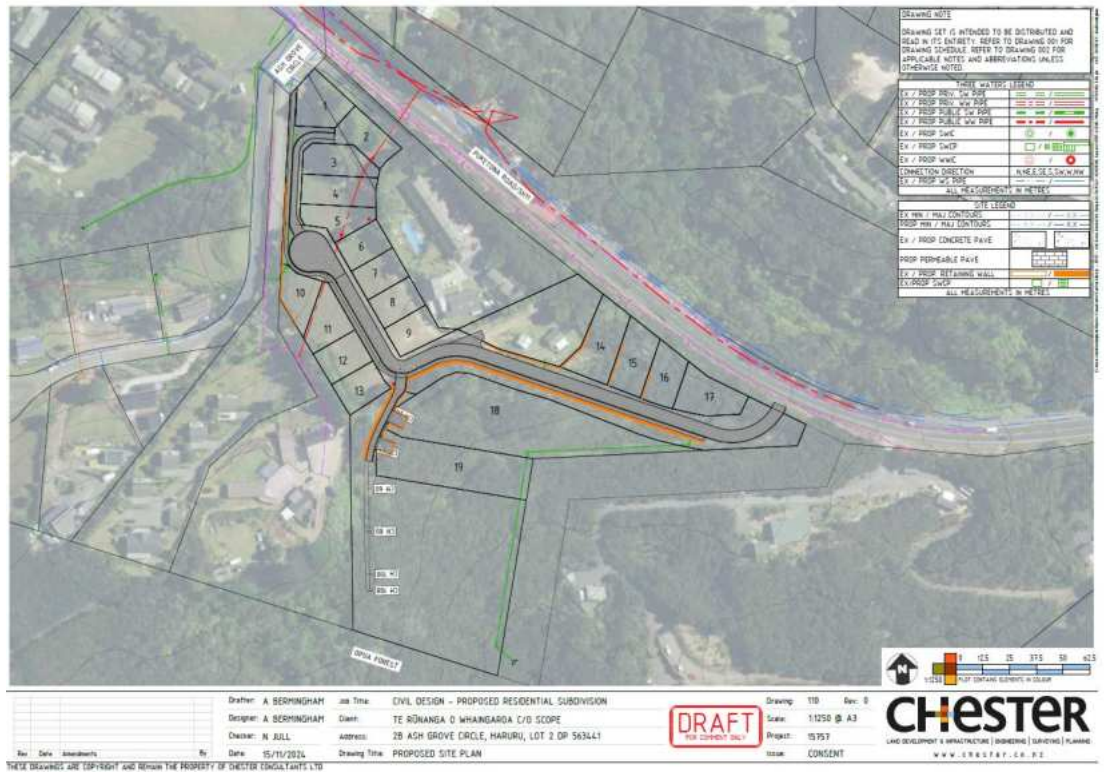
Proposed site plan. Note lot numbers and varying lot sizes.
